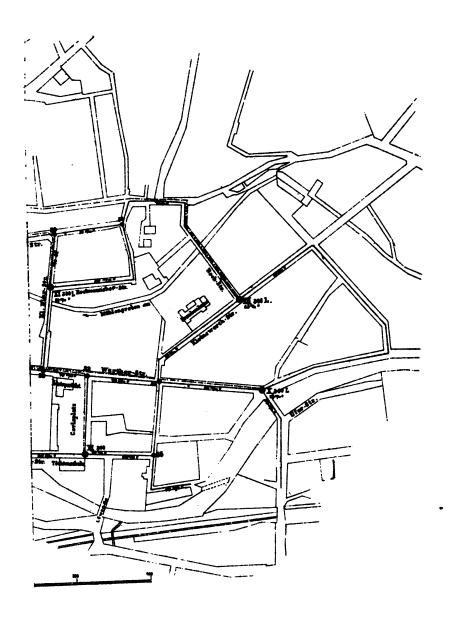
GROUND PLAN OF BARMEN STATION.
